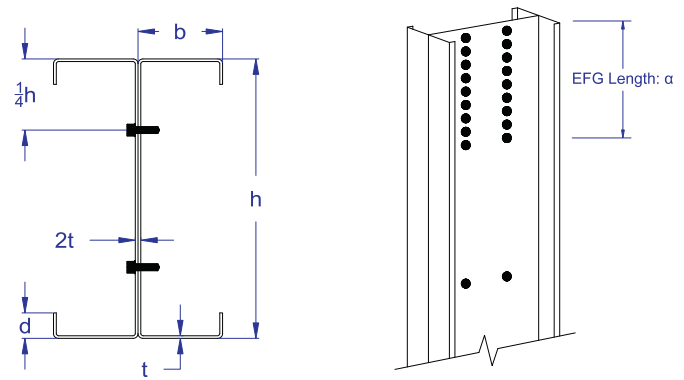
The back-to-back section with web screws shown (left) and placement of EFGs (right).
